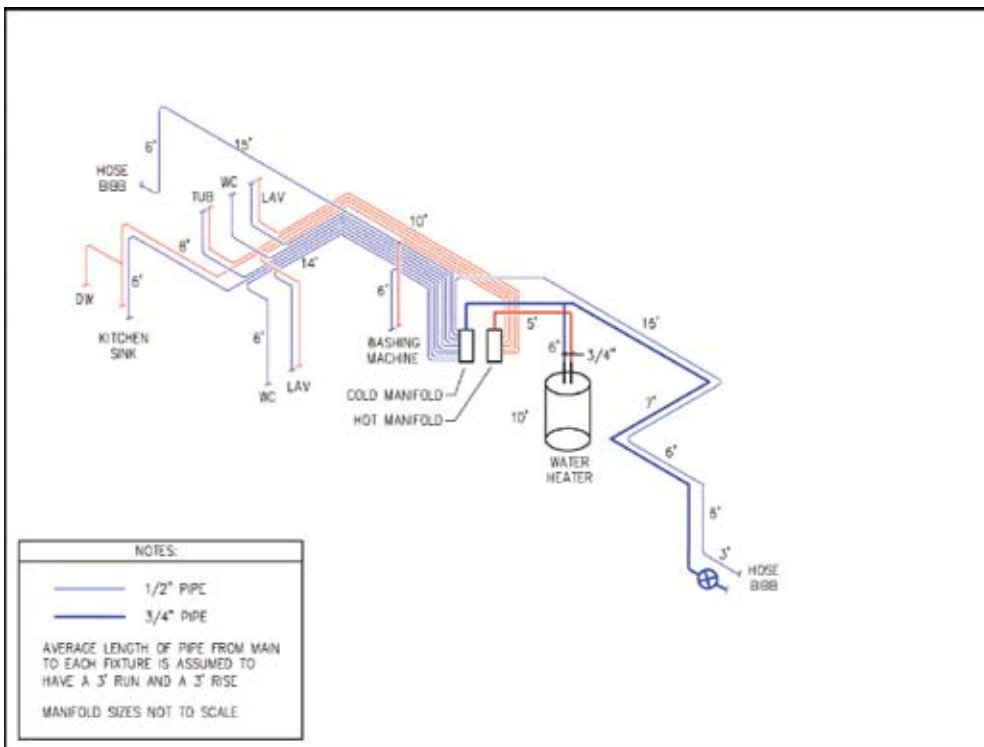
Home-Run Isometric Riser for the Townhouse
